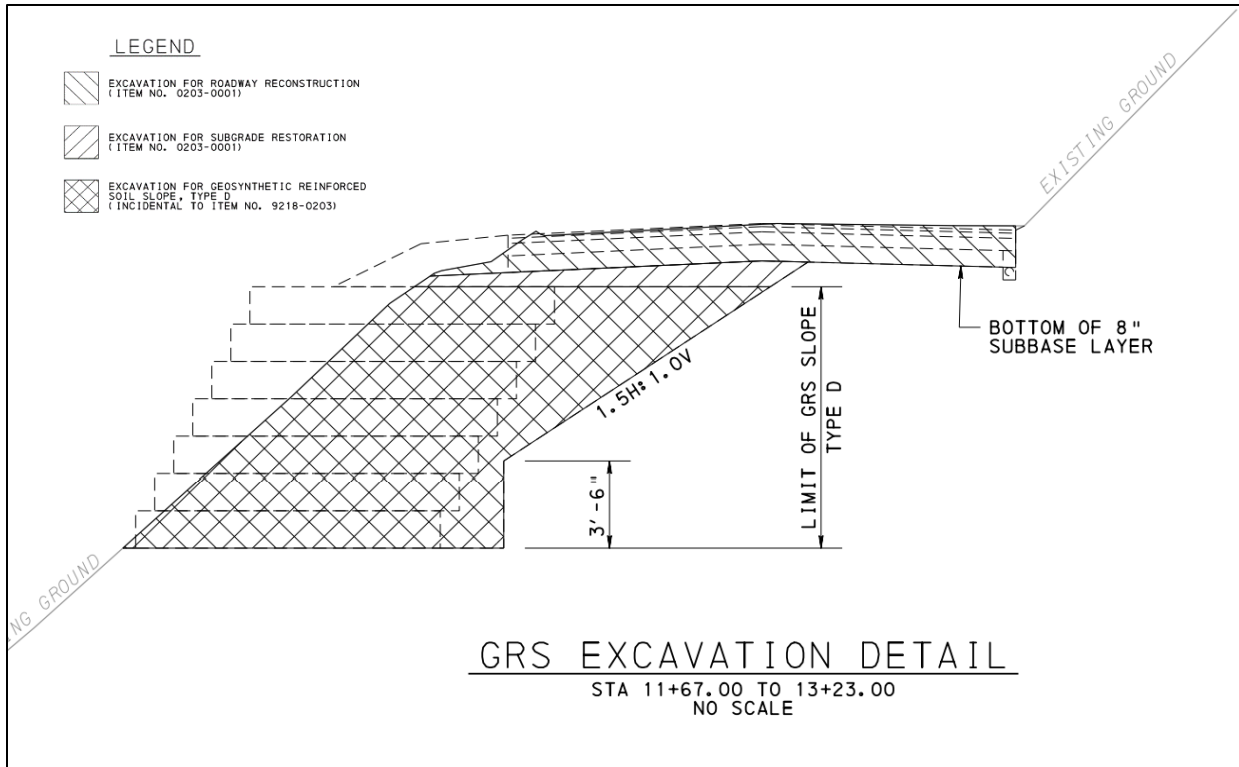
GRS Excavation Detail Showing Pay Items
